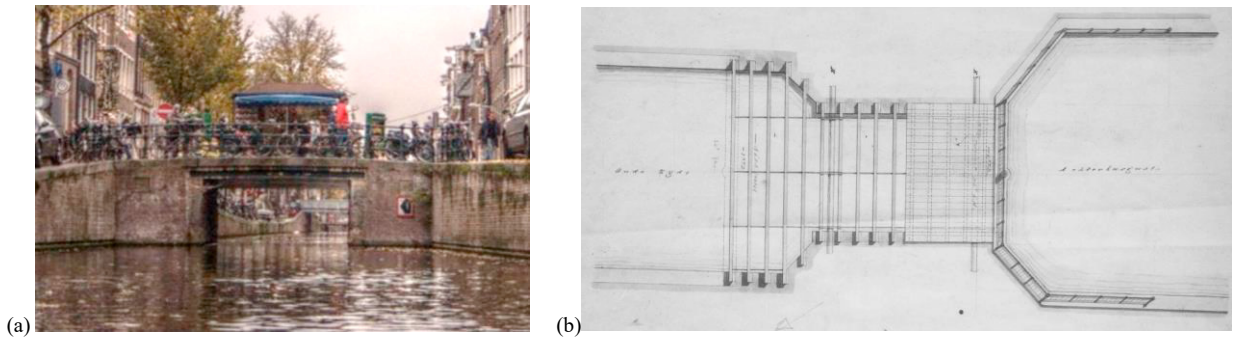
Amsterdam bridge under study: Bridge 215. (a) Photographic image. (b) Original design tables of deck widening made in 1869.
